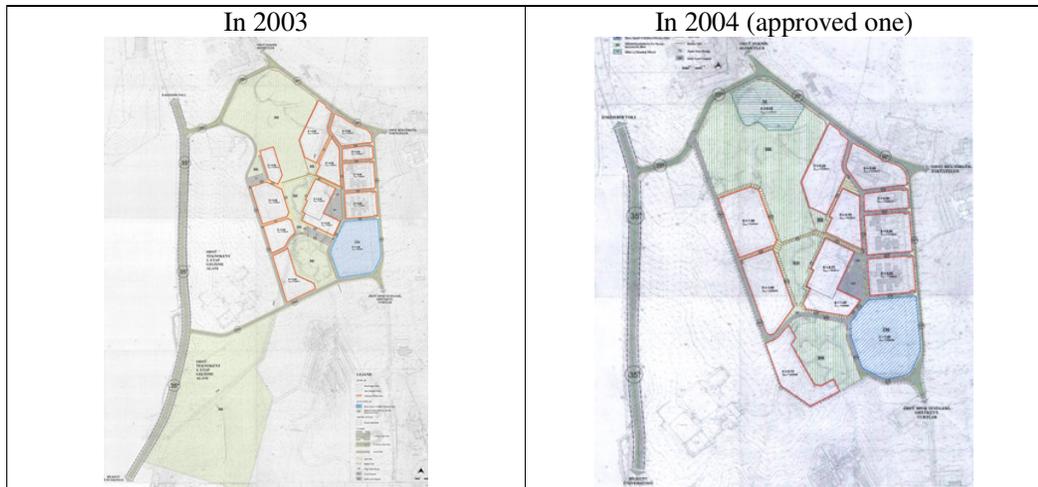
Site Plan of METUTECH (Source: Archive of Teknopark Inc.)
